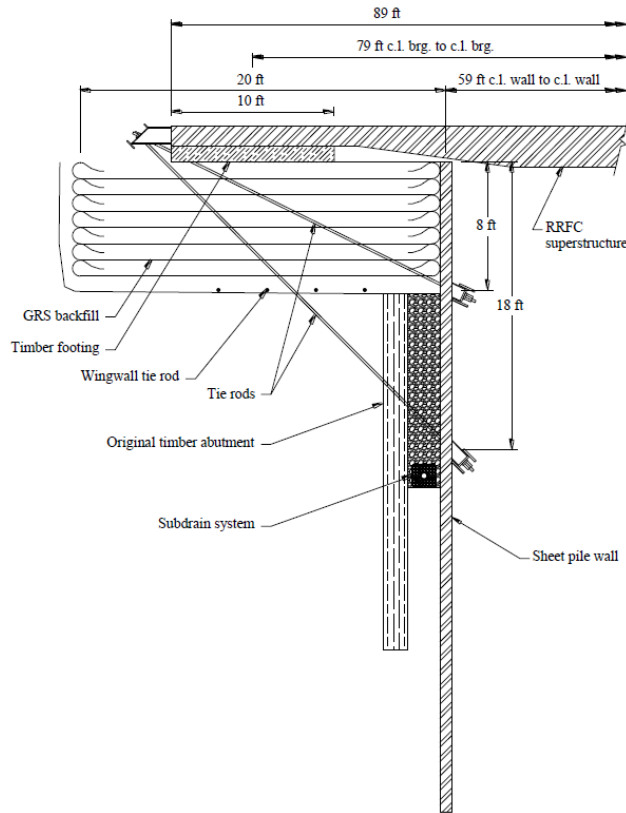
Design details of the sheet pile bridge abutment and backfill retaining system (Evans et al., 2012)
